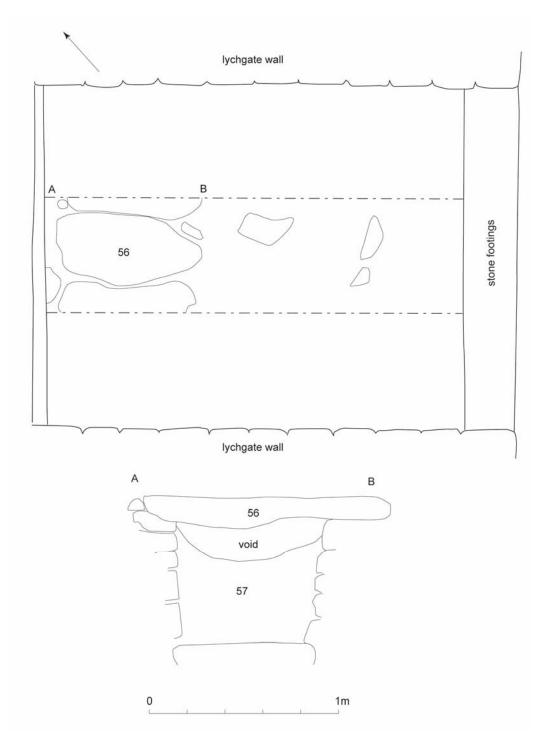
Plan and section of the culvert (56) beneath the lychgate
